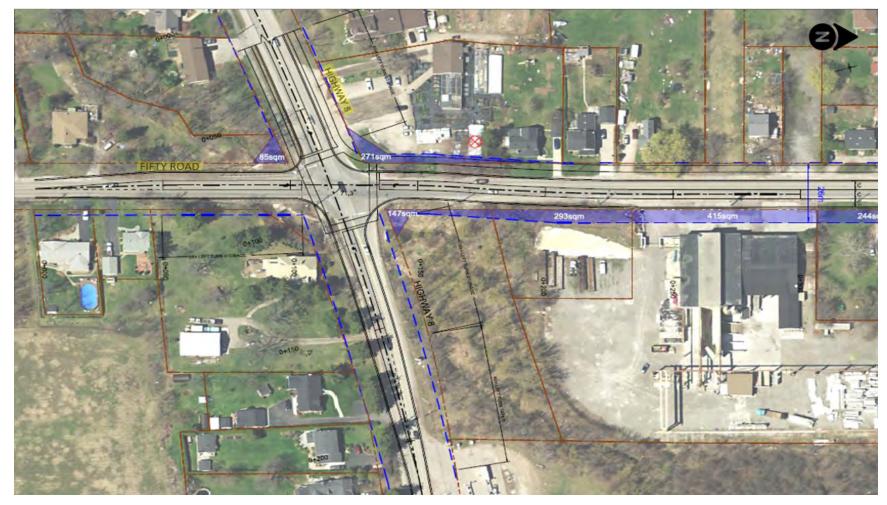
Fifty Road / Highway 8 Intersection Preferred Alternative
